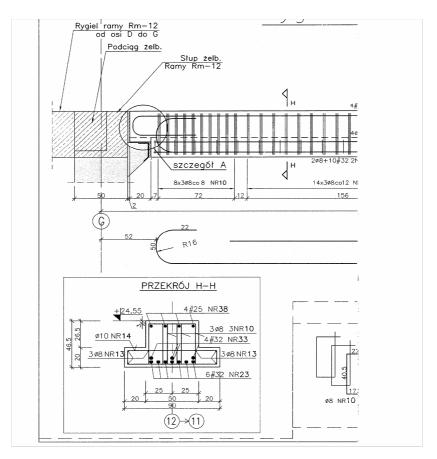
Reinforcement detail of beam bracket and the way it is placed on the column bracket
